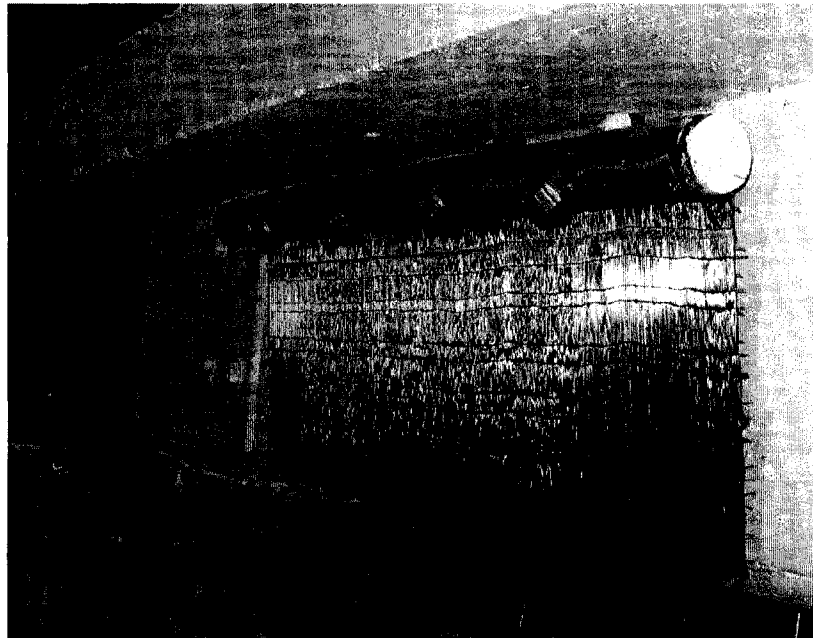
U-shaped dry CF jacket around the shear span zone of beam S-M-D
